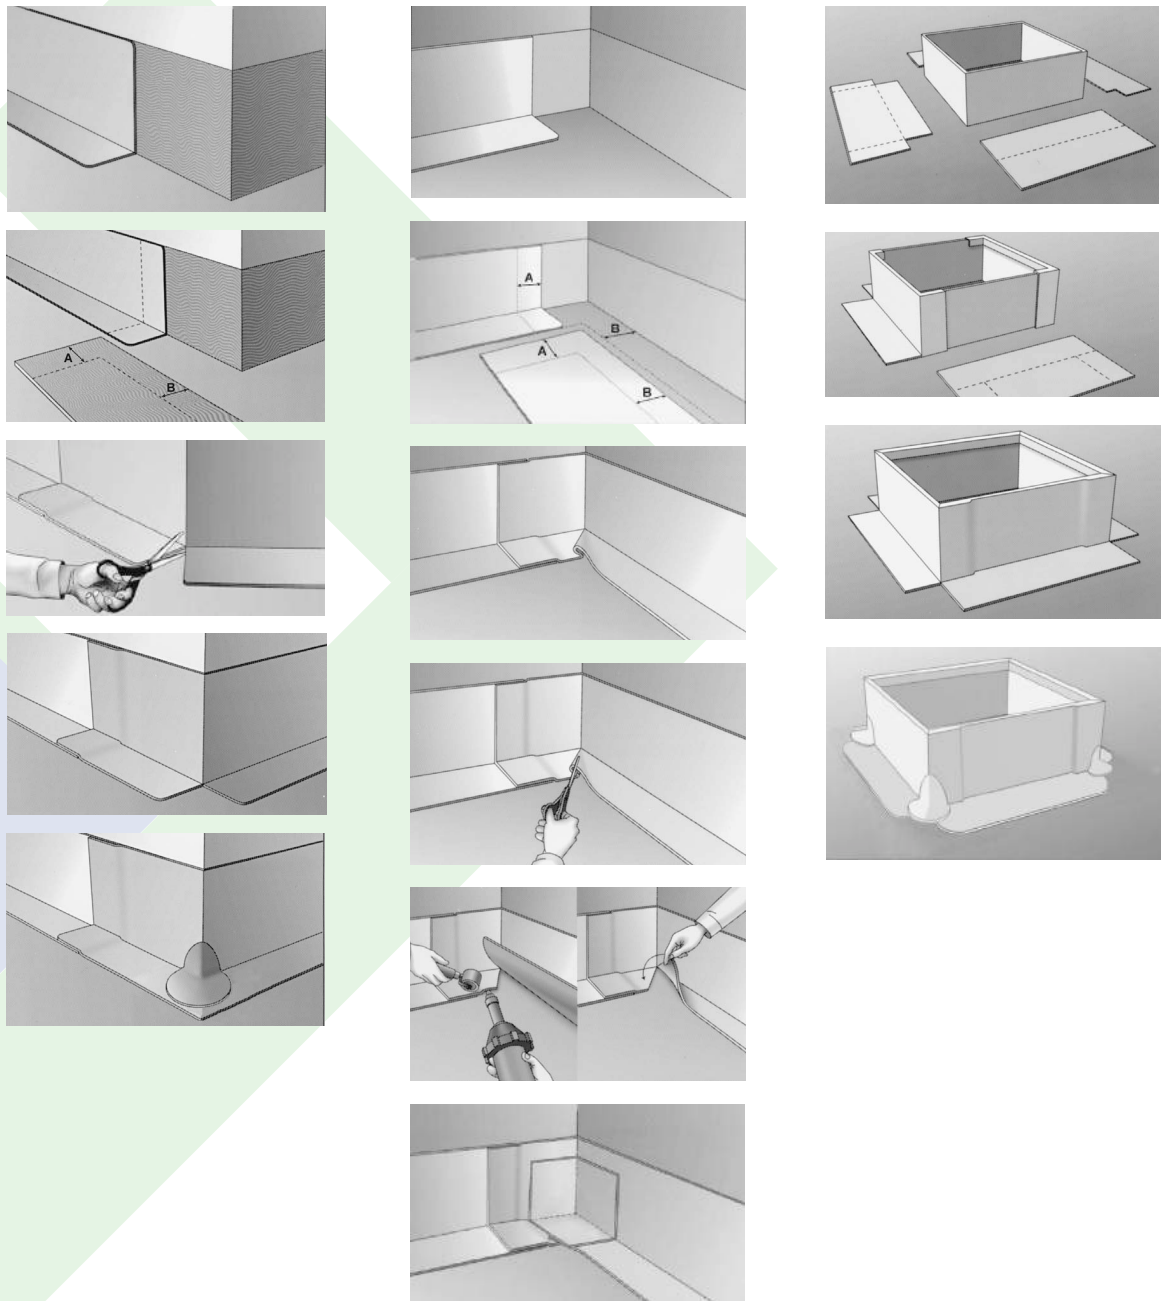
CORNER AND JOINT TERMINATIONS DURING TPO MEMBRANE INSTALLATION
